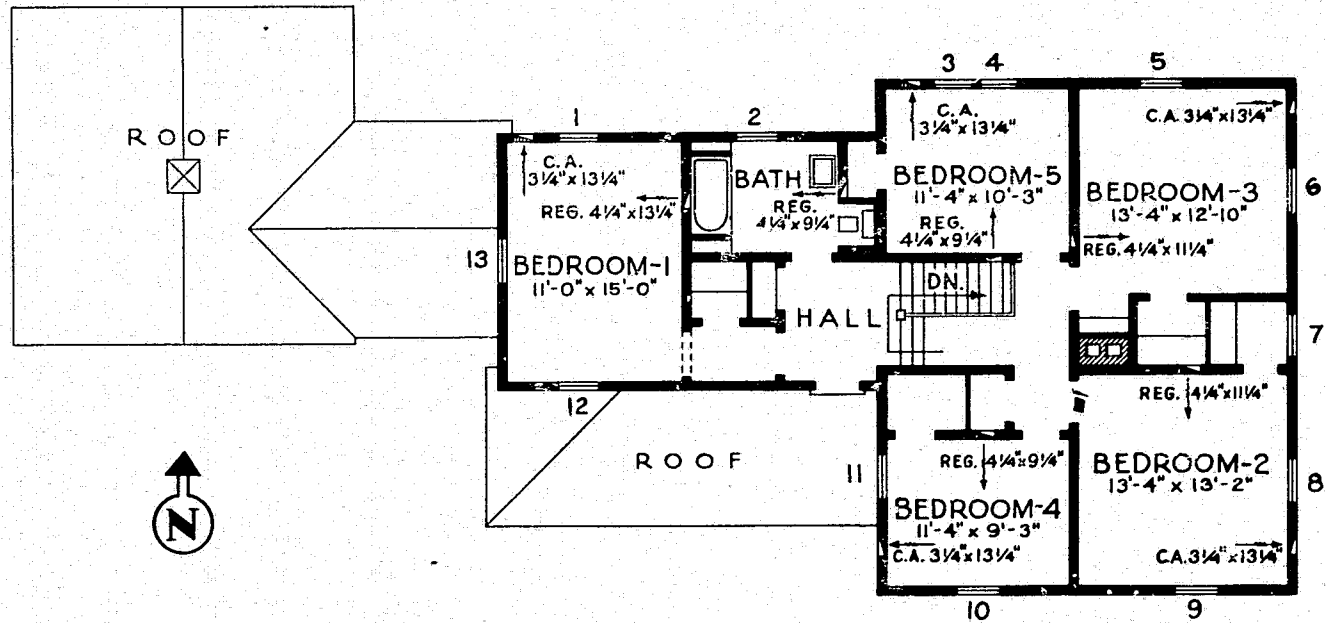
Second-floor plan of house No. 8-R, showing the location of warm-air registers and cold-air returns.
